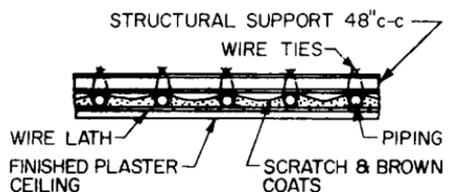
Pipe embedded in a plaster ceiling for radiant heating.
